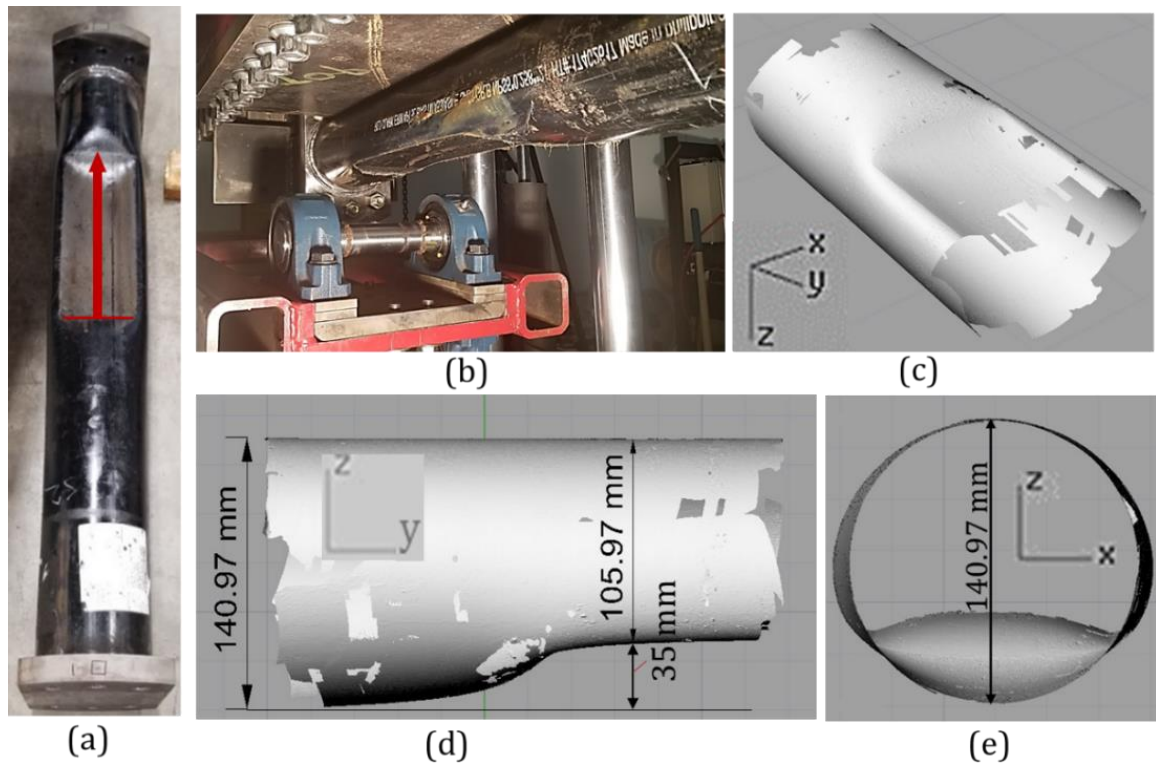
Test 2: Deformed Shape of the Cylindrical Specimen After Test 2; Views of the Laboratory Test (a and b); Scanned Views of a Section Cut of the Deformed Specimen (c, d, and e)
